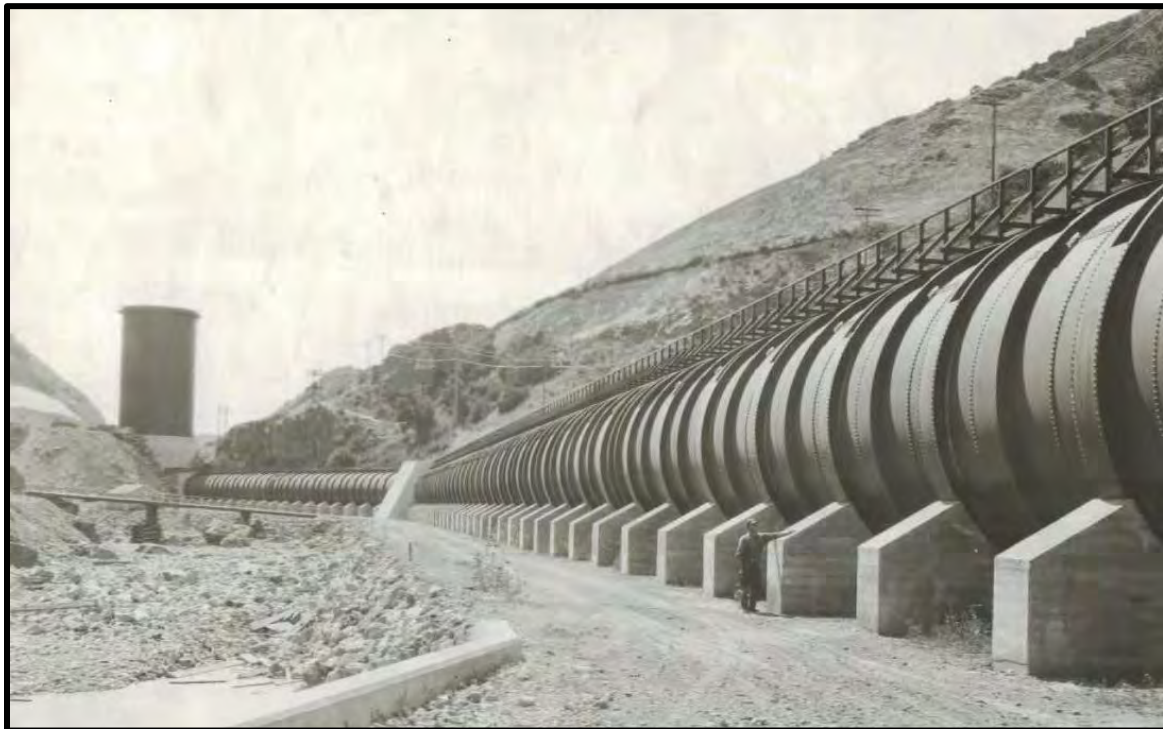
FLOWLINE CONSTRUCTION IN BEAR RIVER CANYON, UTAH, 1925-1927
